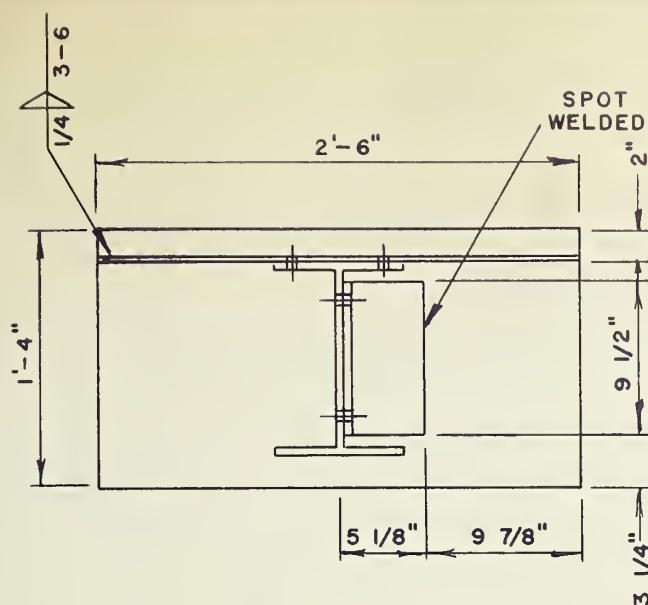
ASSEMBLY DRAWING OF LOADING FRAME
